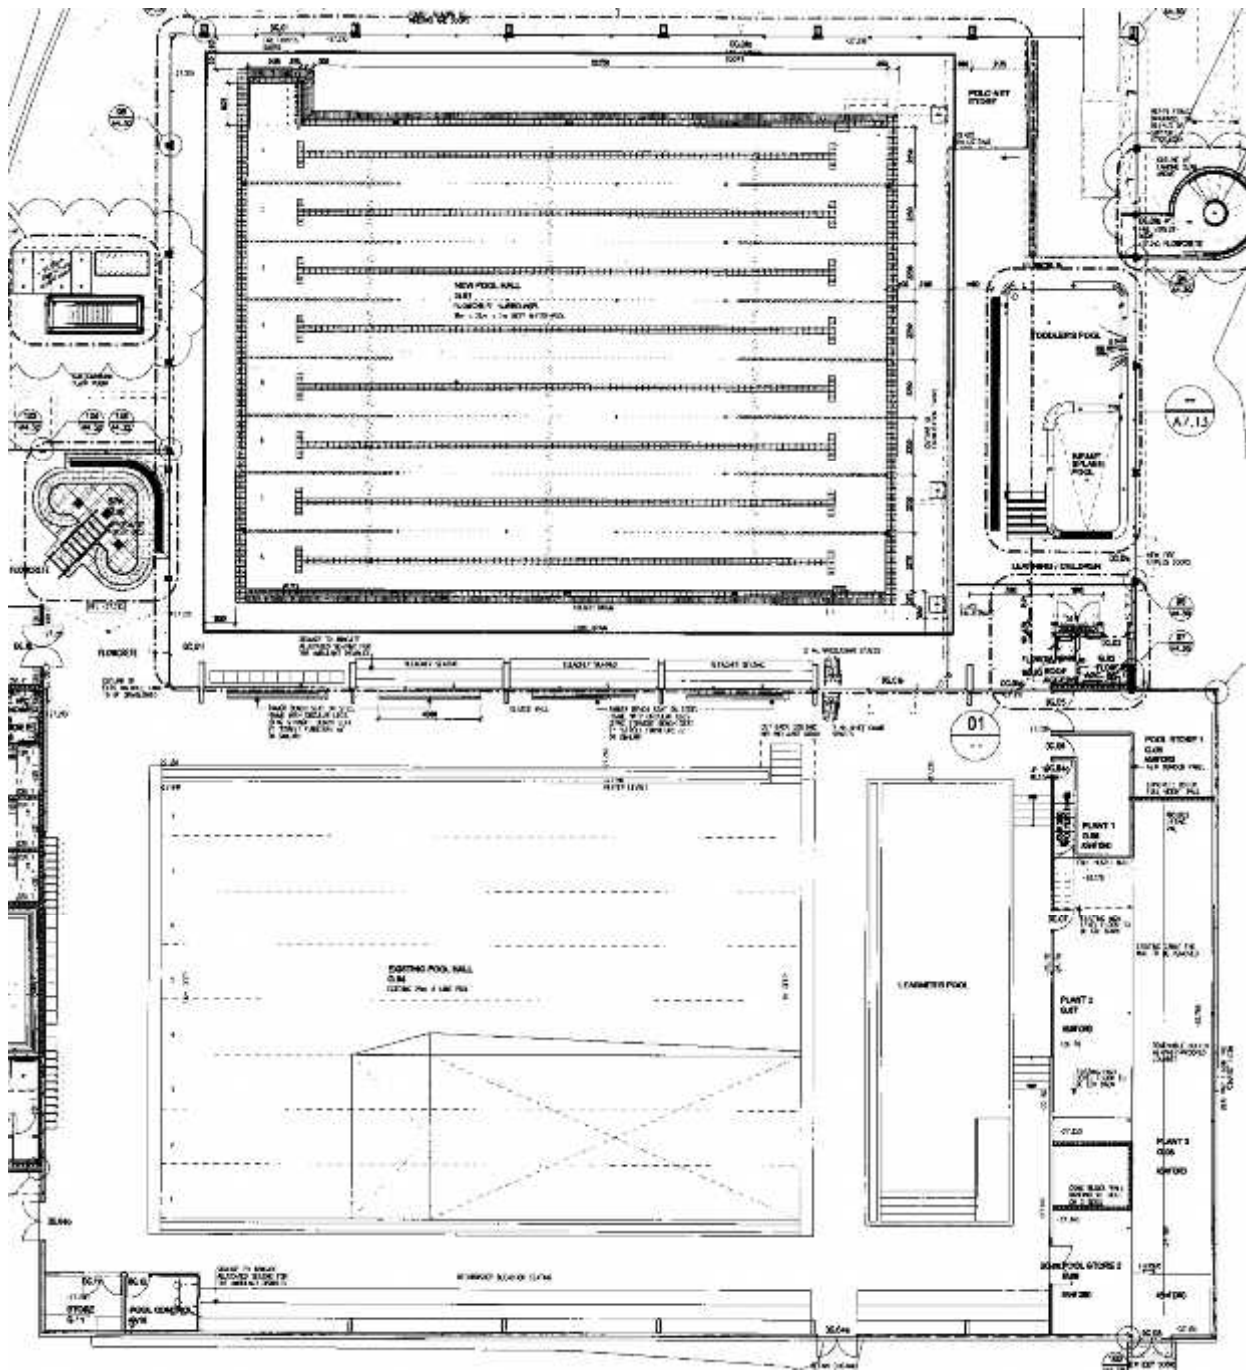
Part Floor Plan – New and Old Indoor Pools
